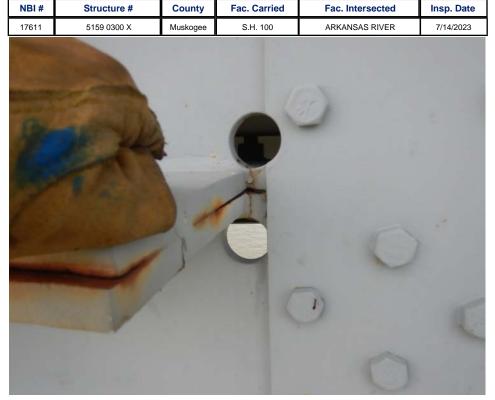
Looking southeast at girder 1, span 5 at the field splice near floor beam 5. Note: 5/8-inch-long crack in the inboard face at the horizontal web splice termination.
